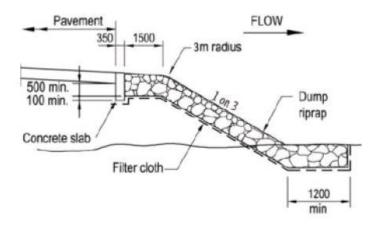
, Riprap protection (Department of Transport and Main Roads)
